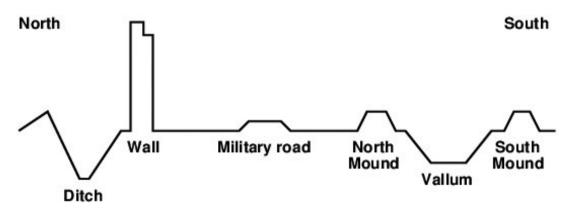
Cross section of Hadrian's Wall. From Burton 2012, 23.
